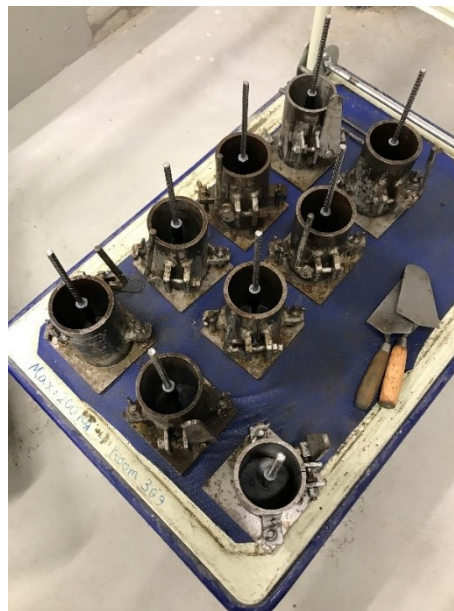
10 Rebars sitting in steel moulds ready for concrete casting
